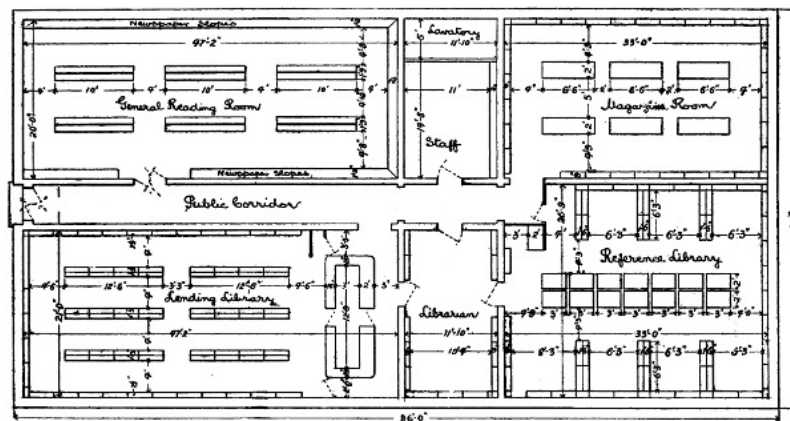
Sketch Plan for a Small Town Library ([Section 119](#)).
